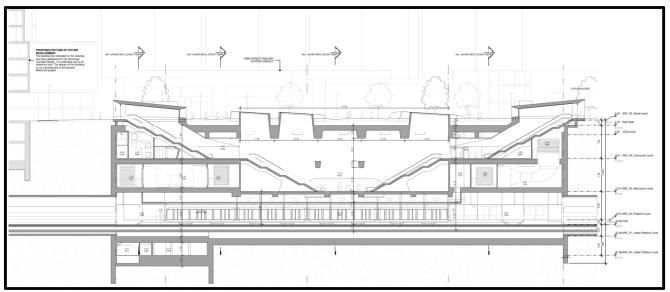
Proposed Longitudinal Section of proposed Tara Station
